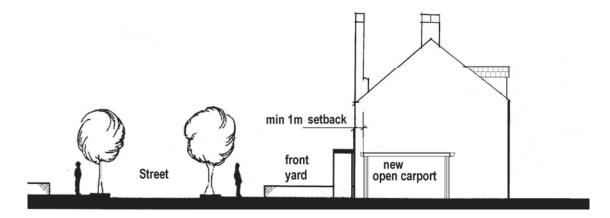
Side view – a new open carport must be set back at least 1 metre from the front façade of the dwelling.
